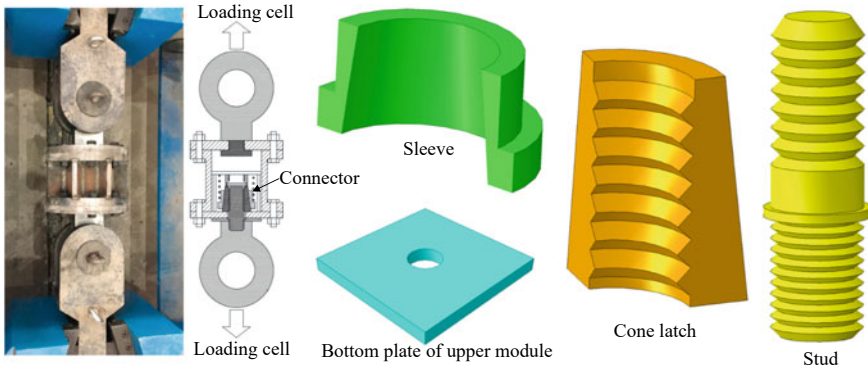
Connector specimen under pull-out test (geometric details can be found in [5])
